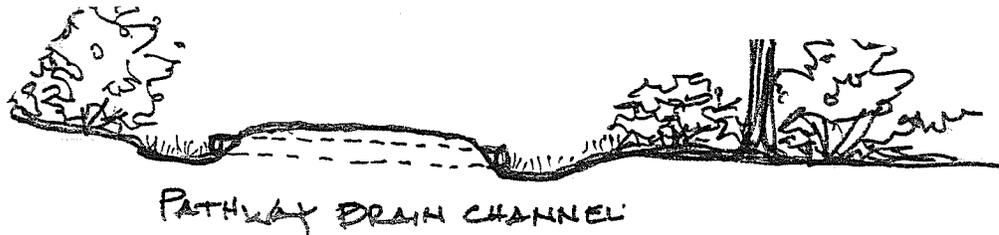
Section of pathway with drainage channel, M. Mitchell
